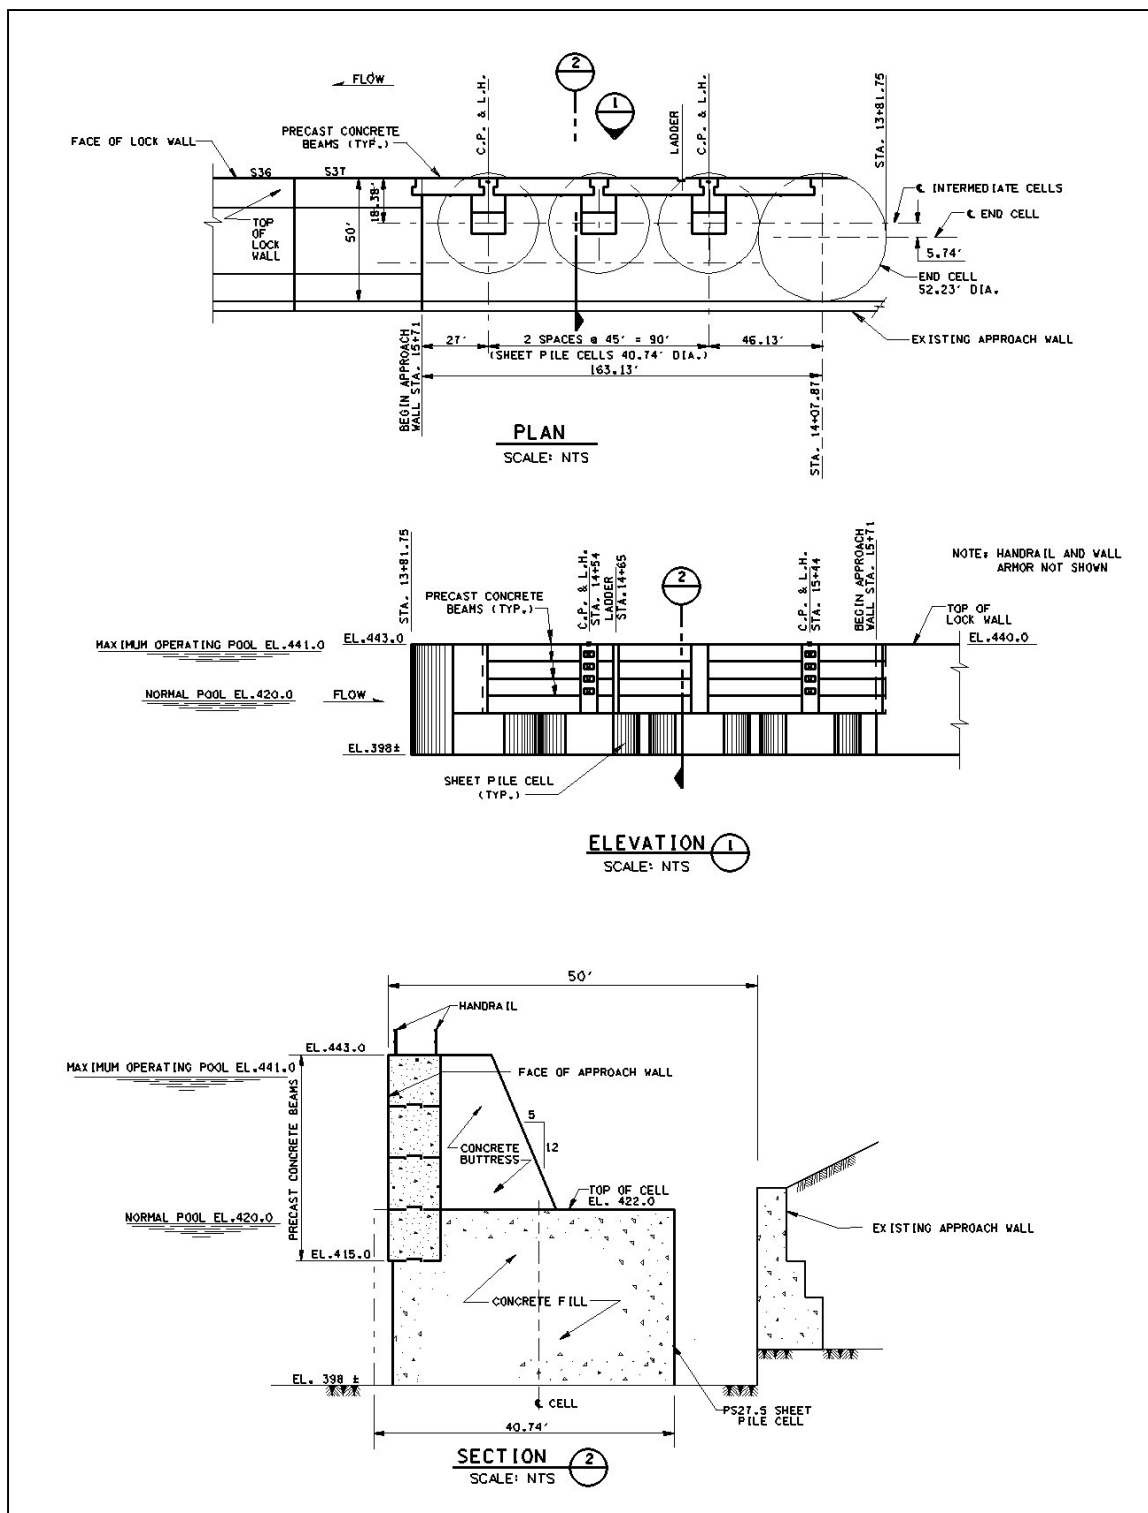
McAlpine Lock upstream approach wall. Substructure is a concrete-filled sheet-pile cell founded on bedrock. The cell is installed in the wet and is outfitted to receive the first precast beam. The concrete buttress is built in the dry and transfers barge impact loads to the substructure
